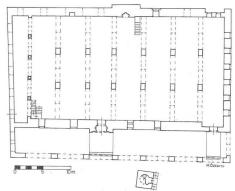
Ulu Mosque and Minaret ground floor plan (Gönültaş, 2018)
